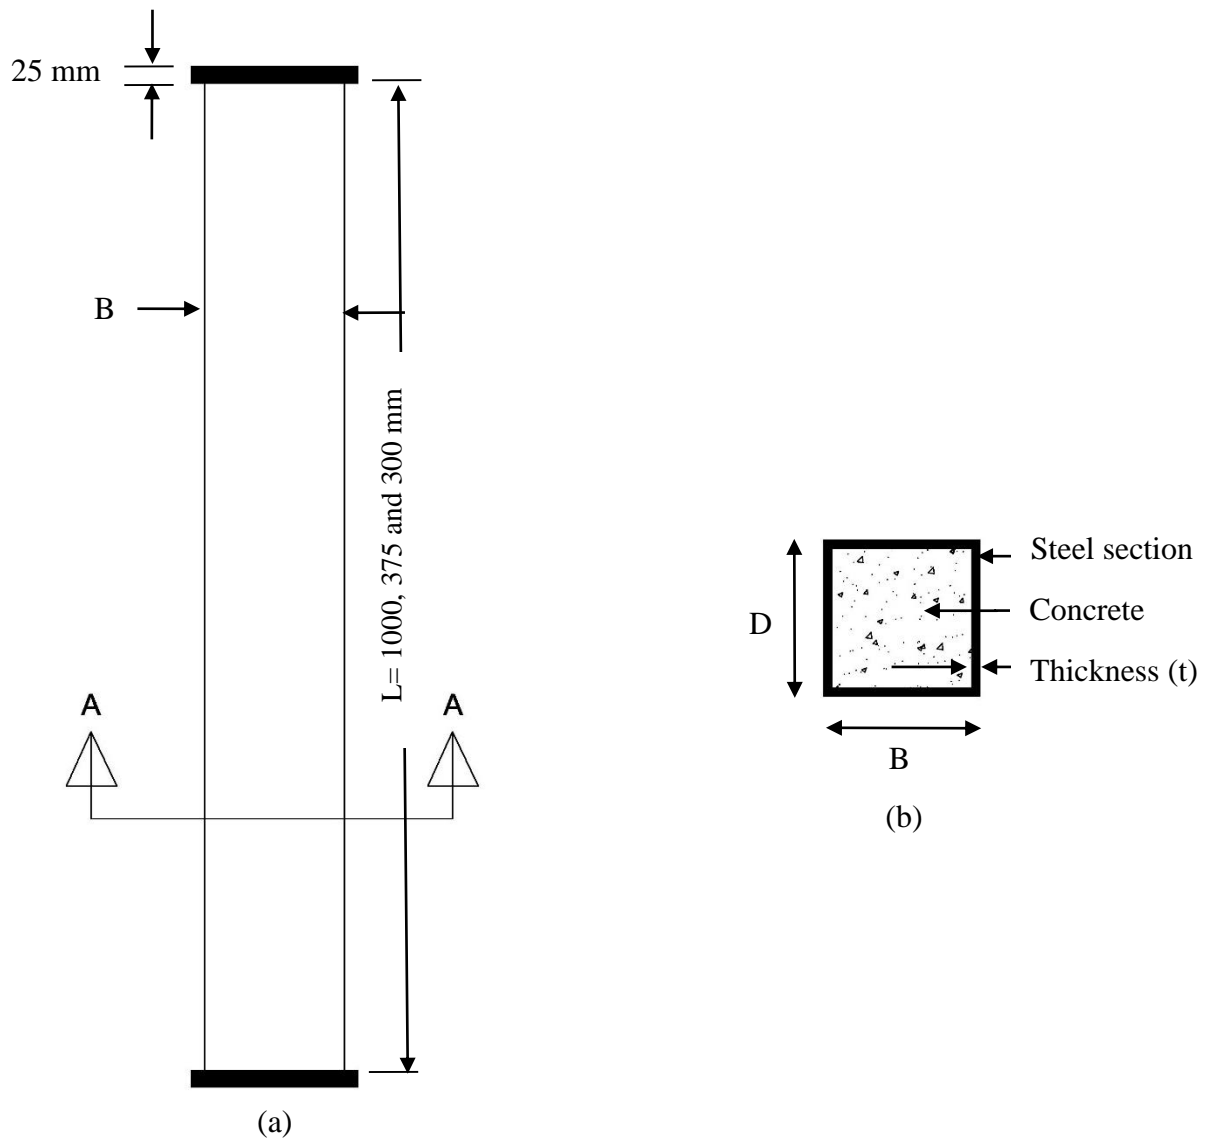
Geometry of CFST columns (a) Elevation (b) Section A-A
